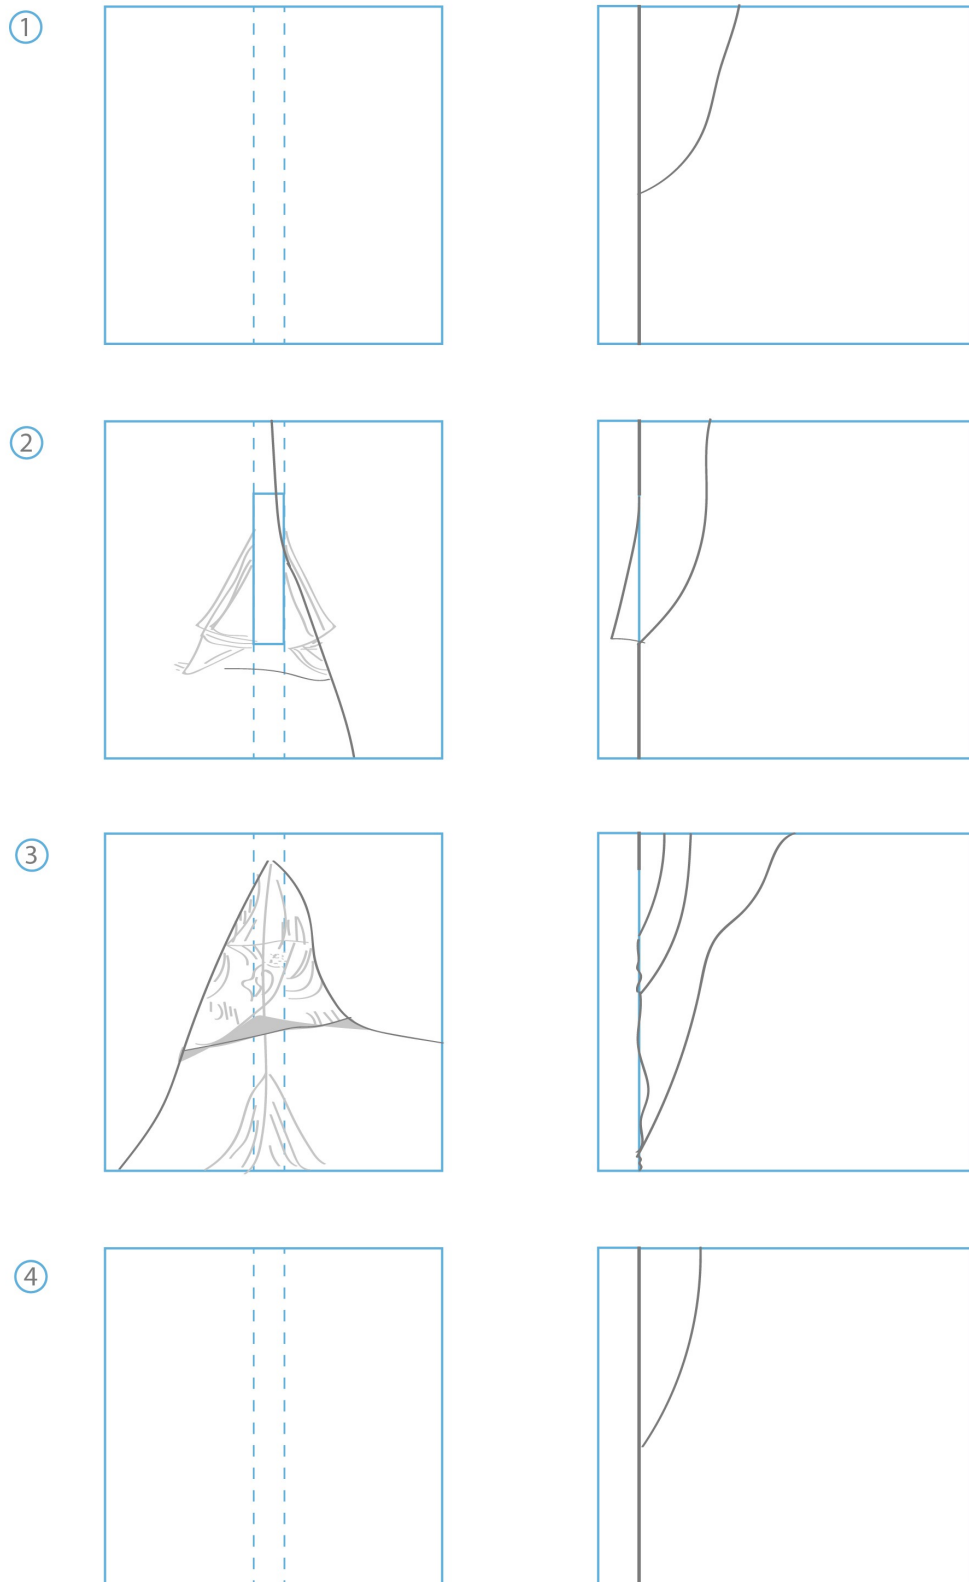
Cracks in specimens 1 to 4 (adhesive) after the shear test.
